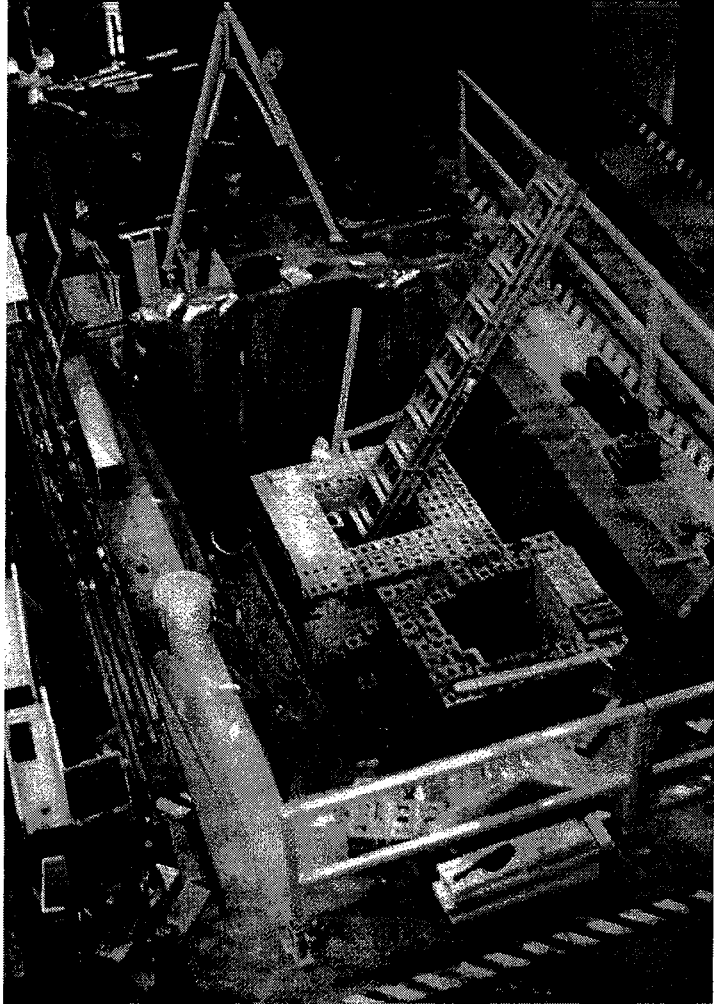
Construction of the manhole chambers supported by concrete slabs
